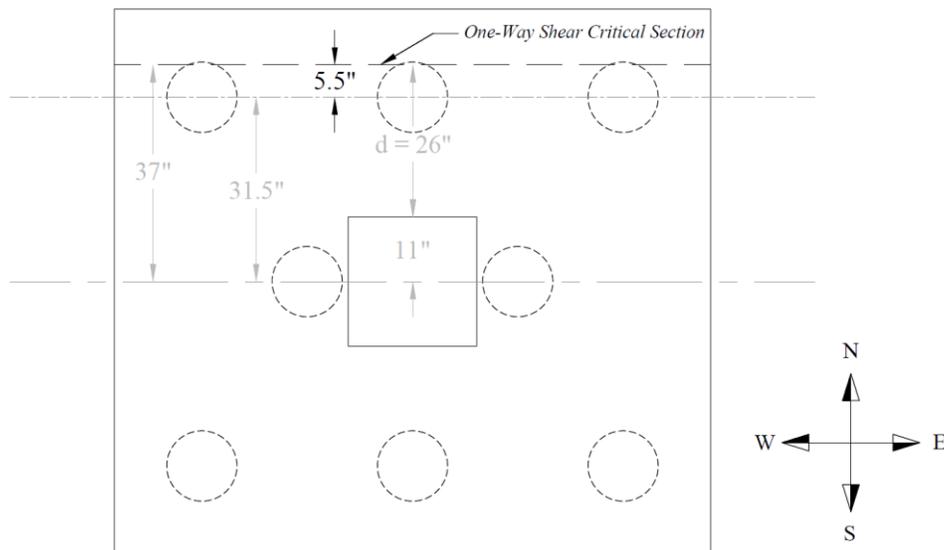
One-Way Shear Critical Section in the North/South Direction
